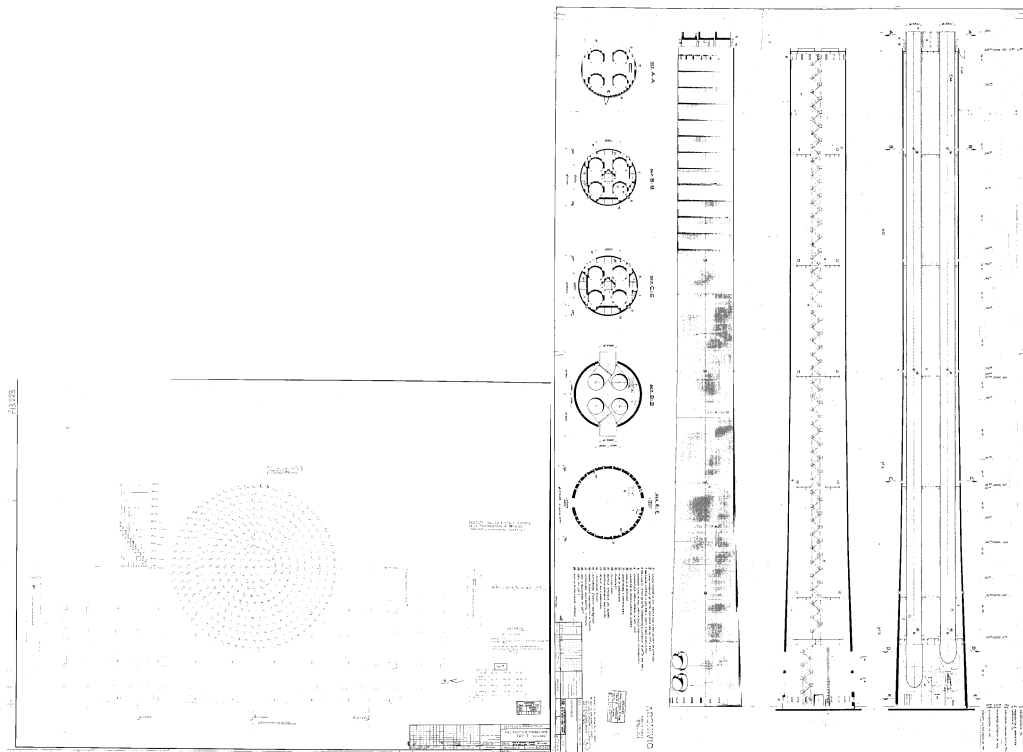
Archive drawings of the Porto Tolle chimney project and its foundations [Enel,1976].
